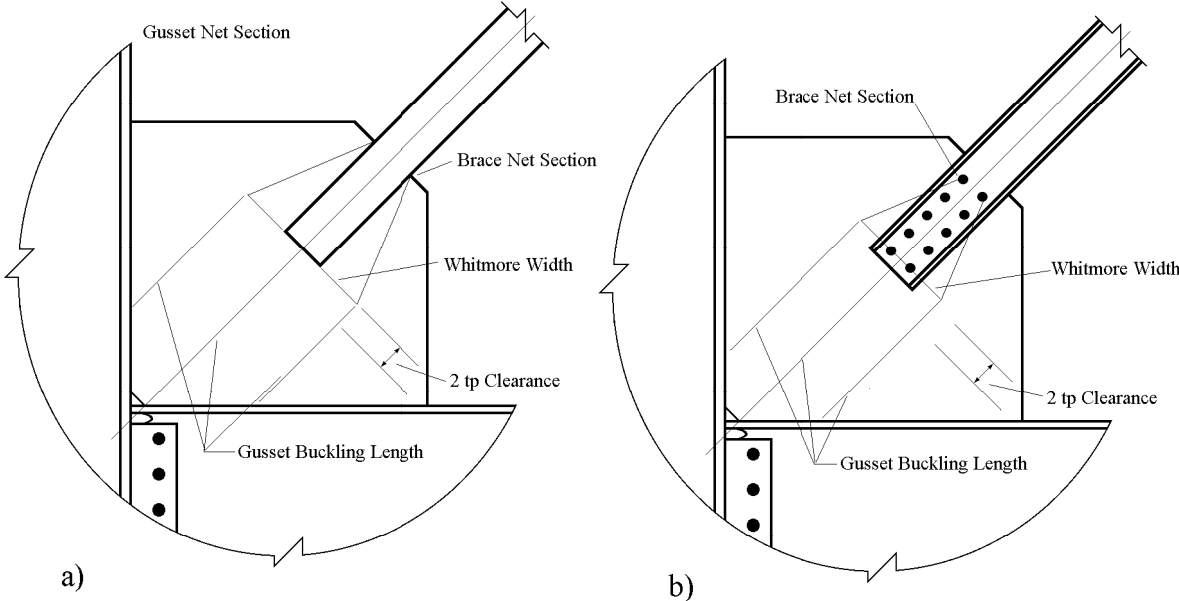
UFM gusset plate design parameters, a) HSS tubular brace welded to gusset, b) Channel brace bolted to gusset
